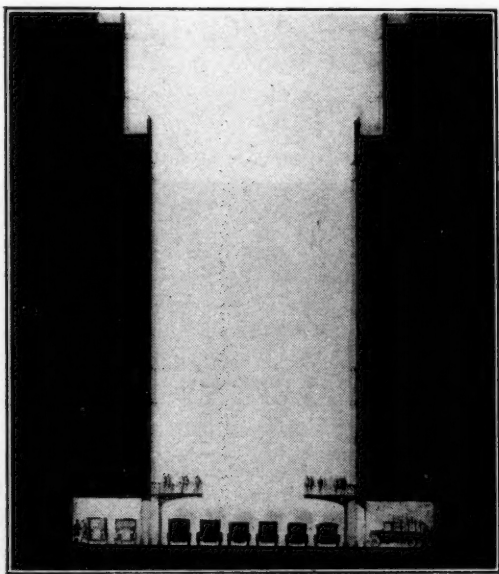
VIEW SHOWING PROVISION FOR PARKING SPACE UNDERNEATH BUILDINGS.
